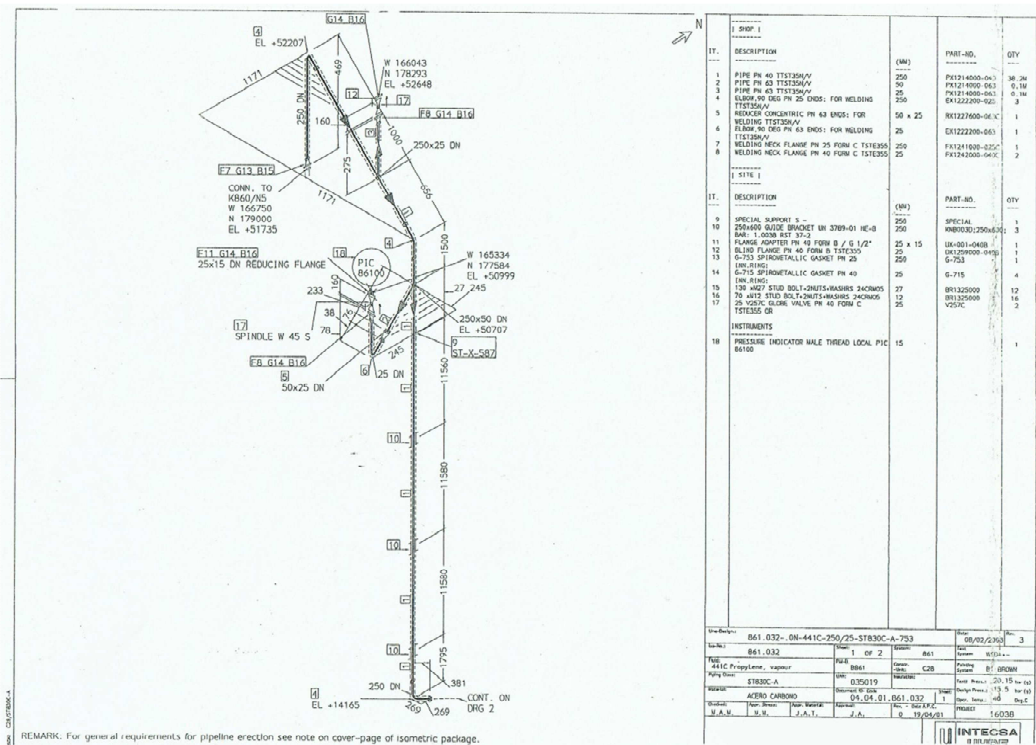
Isometric drawing of YS861-04 sheet 1.
